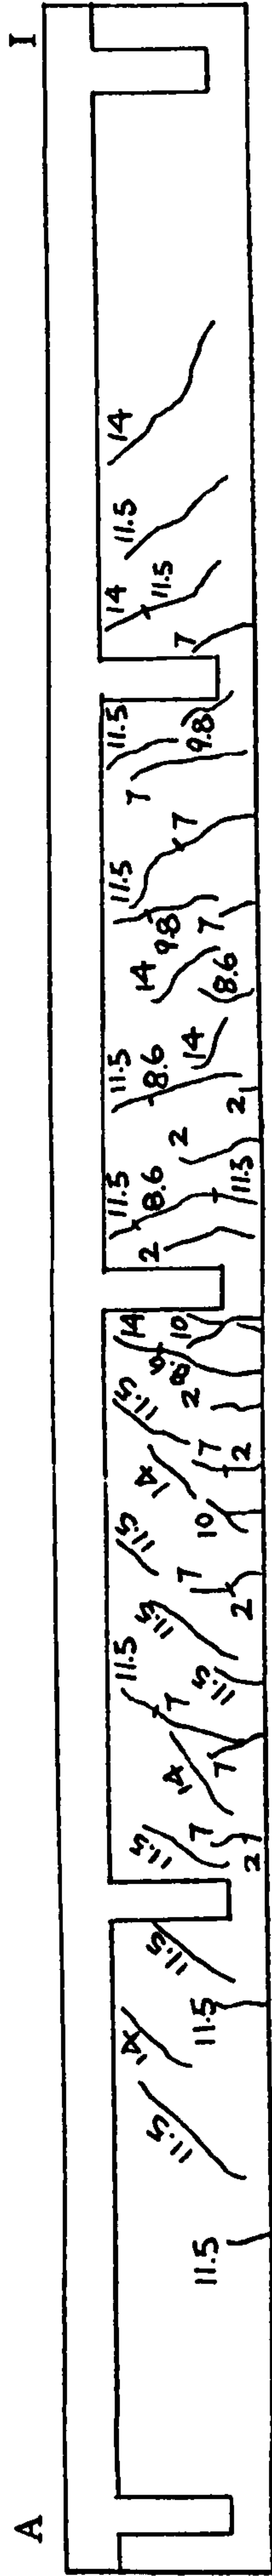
(a)-Crack Pattern on the Sides of Beam #1 of the Model Bridge Deck
